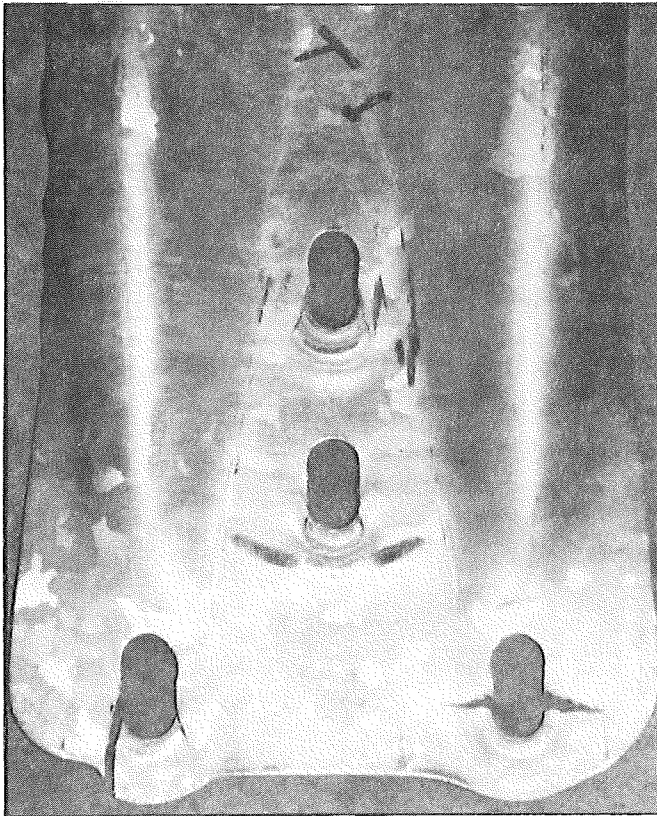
Typical damage sustained to the anchorage shoe where it would attach to the bridge railing. This was due to the upper fixture deforming and not gripping the specimen properly. Test Nos. 8, 9, T1 and T3.
